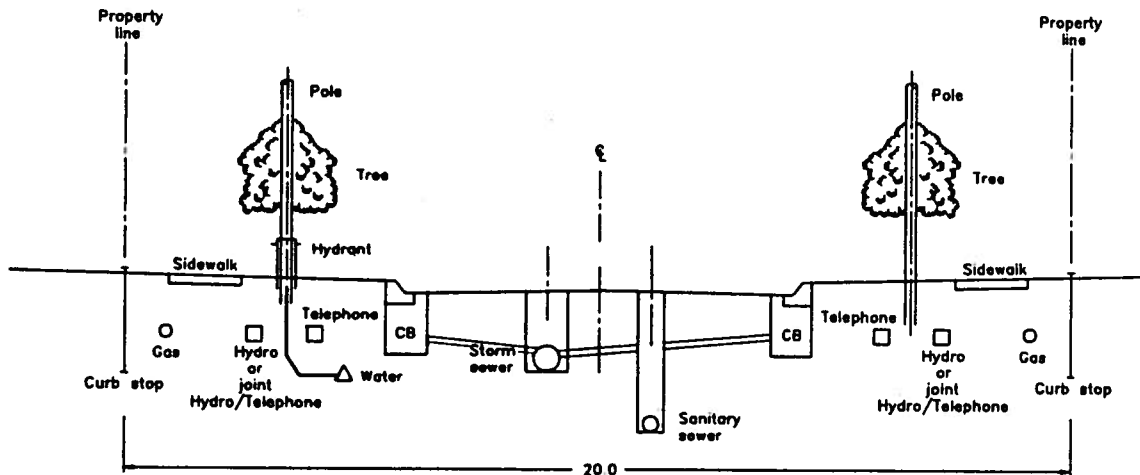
Typical curb and gutter drainage system with catchbasins and storm sewers
